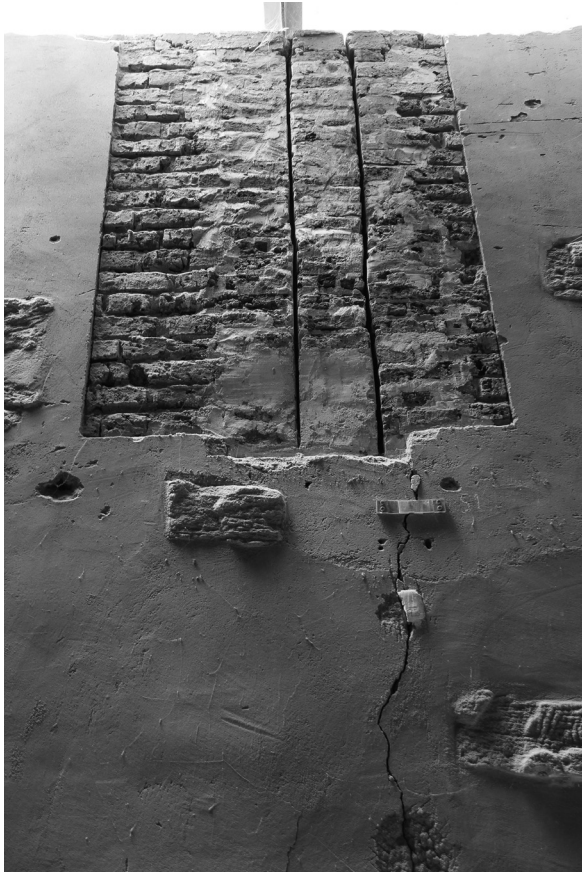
Section of missing plaster on the inner south wall of the Apedemak Temple (photo: Cornelia Kleinitz).
